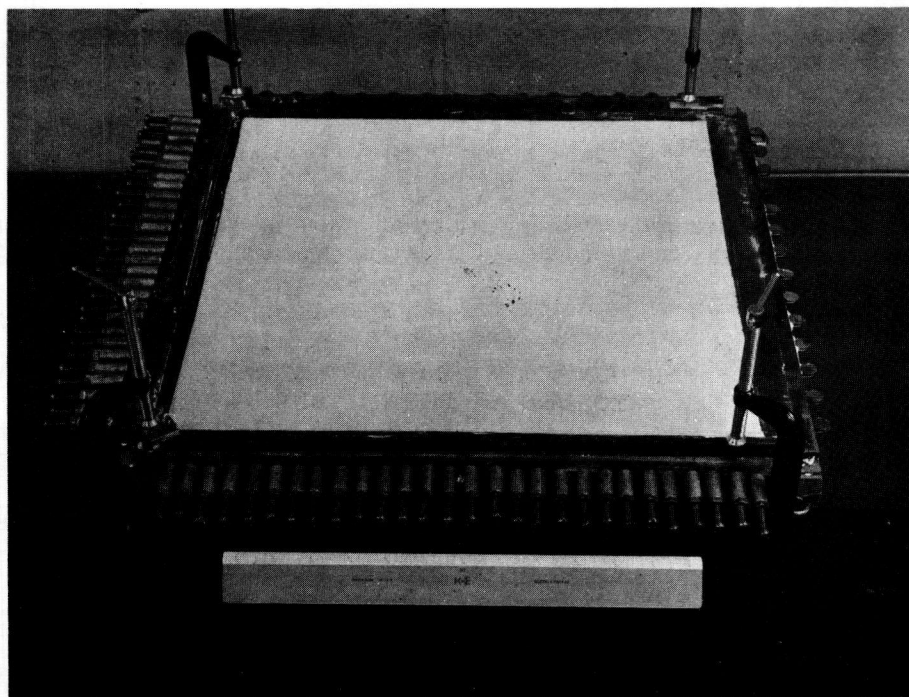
Test slab approximately 45 min after casting. Prestressing applied and casting frame removed after a minimum curing period of 7 days.
